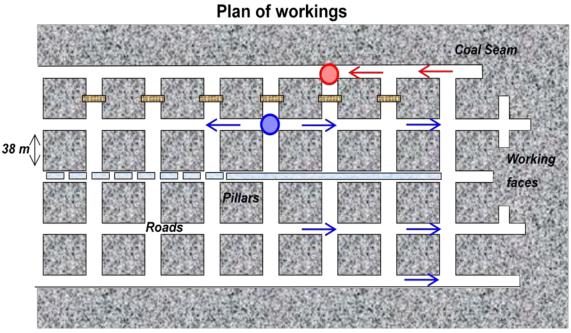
(b): Plan View of Underground Workings
